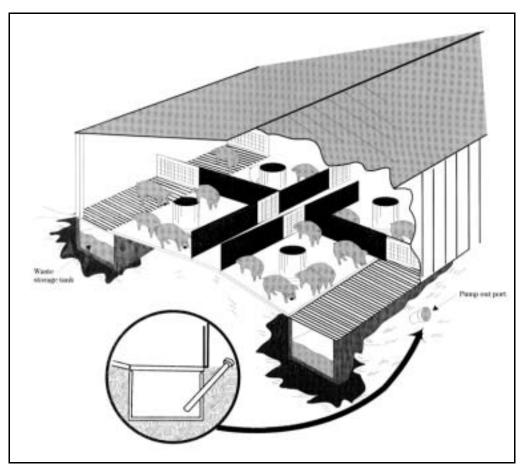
Fed hogs in confined area with concrete floor and tank storage liquid manure handling (USDA NRCS, 1996).
